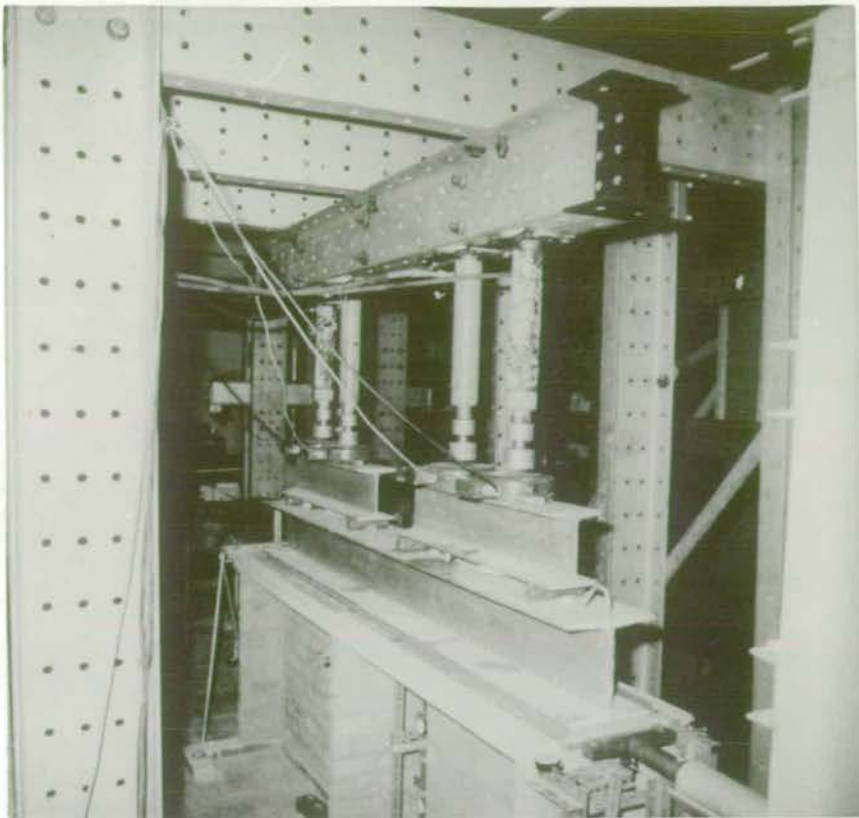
LOADING ARRANGEMENT FOR THE APPLICATION OF PRECOMPRESSION
